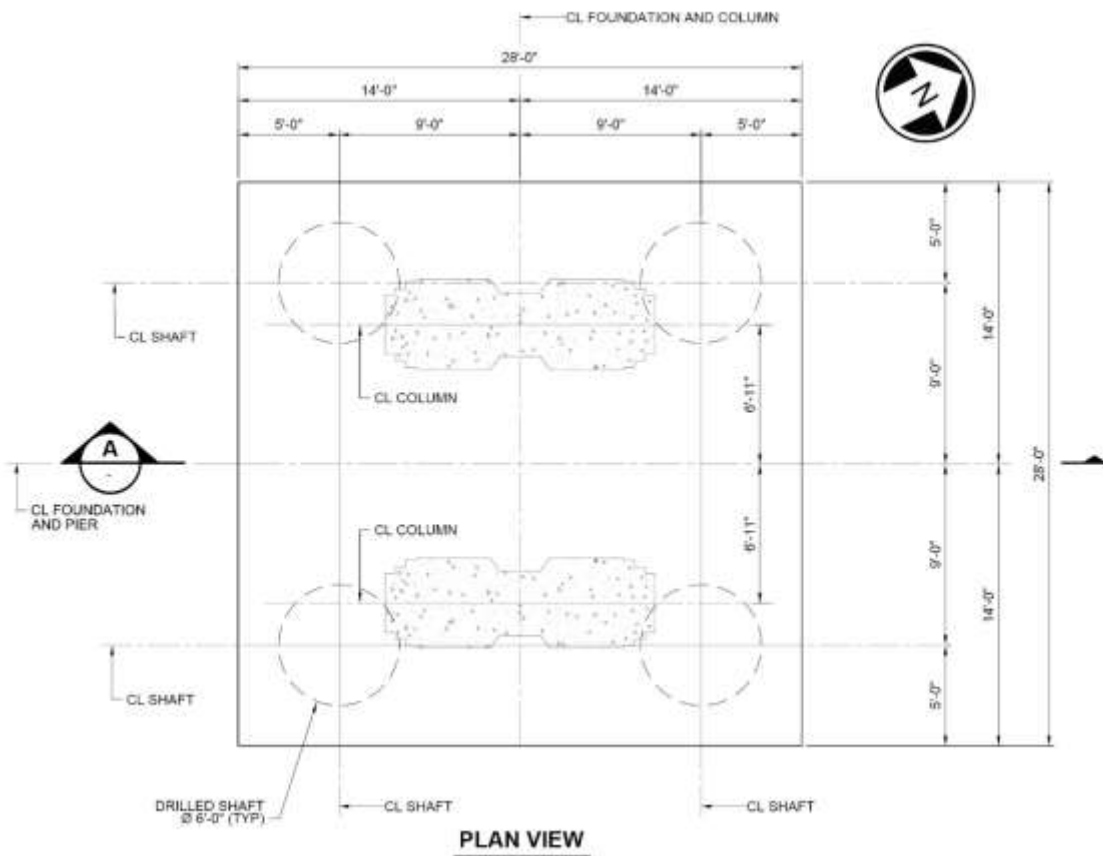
Drilled shaft layout for the I-405 crossing for the Sound Transit guideway.
